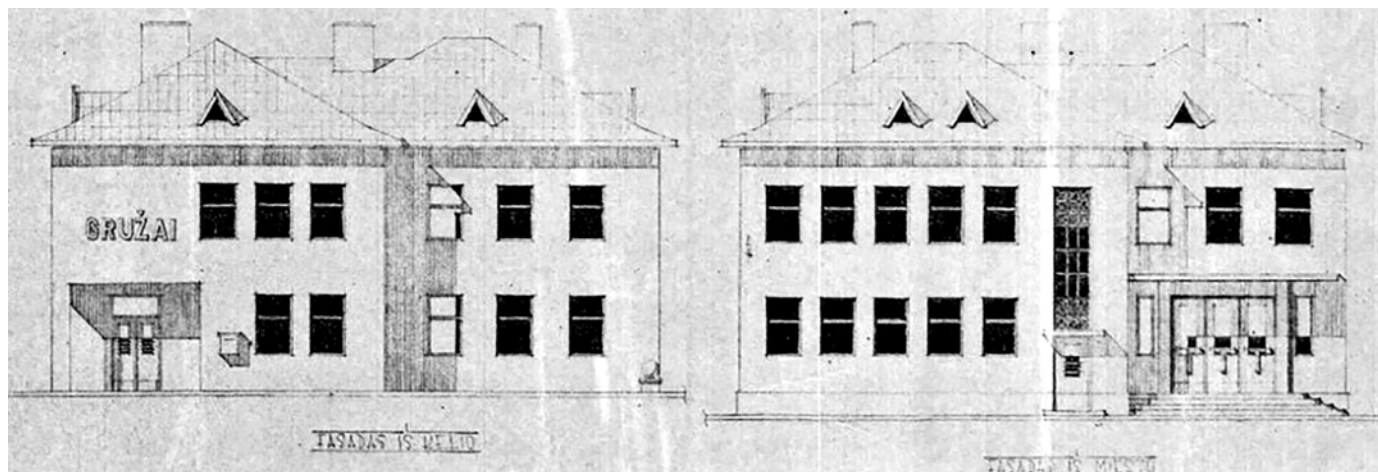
Design project of a standard masonry narrow-gauge railway station building for construction in Mažieji Grūžiai and Lauksodis (1940) [Drawing from Lithuanian Central State Archives].
